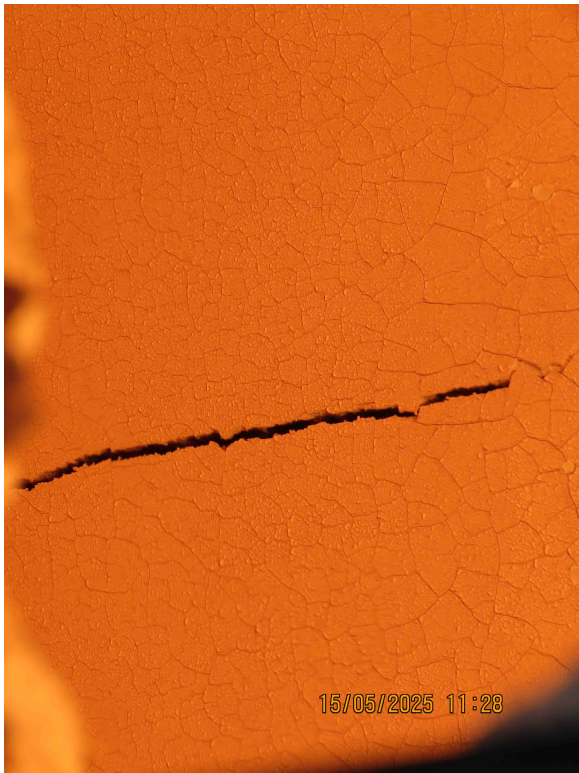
28 minutes after the start of the test - horizontal crack forming on exposed surface .
